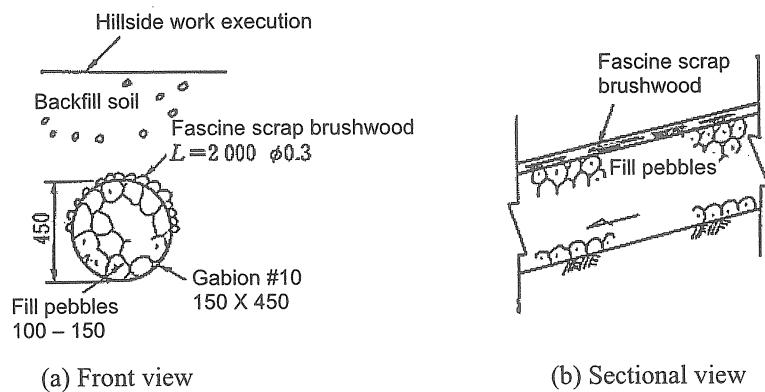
Example of a Gabion Culvert (unit: mm)
